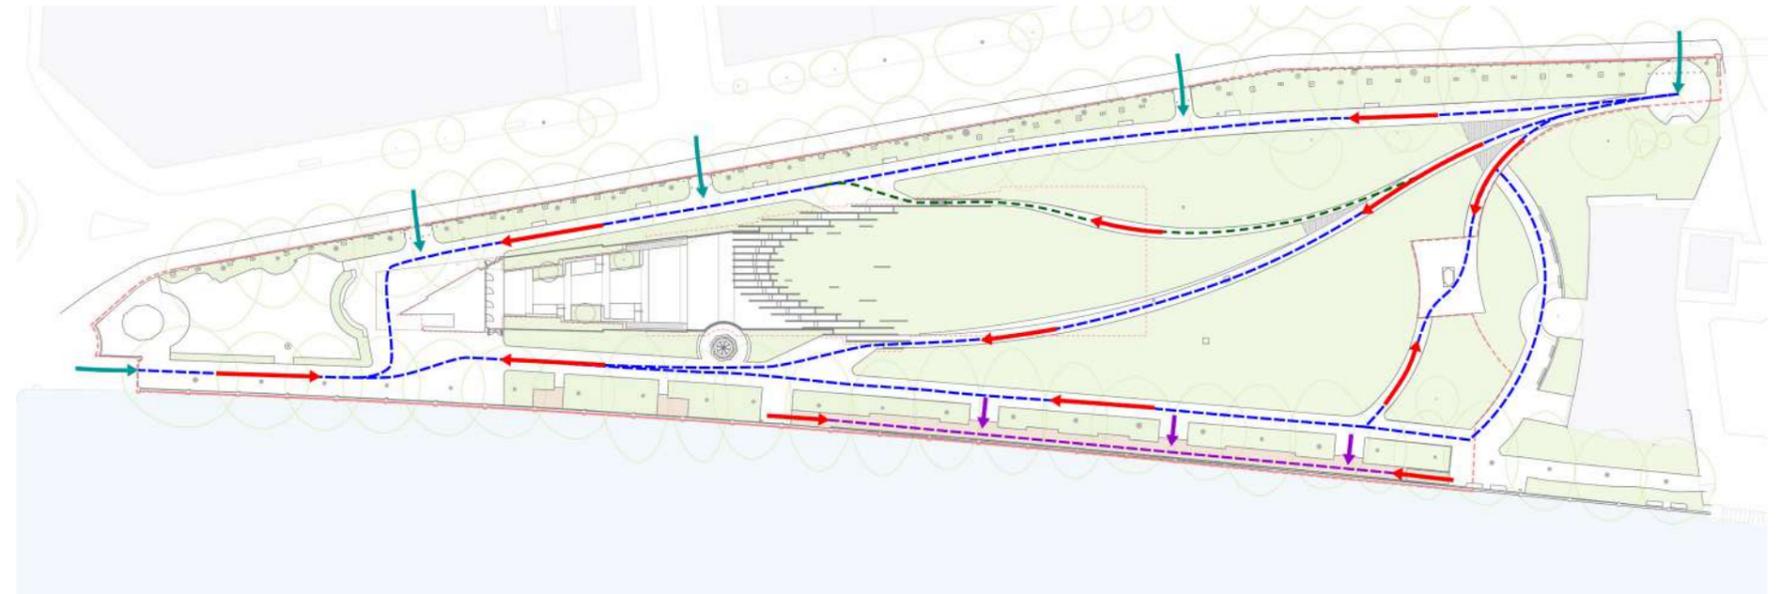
PROPOSED PLAN OF PATH NETWORK AND CONNECTIONS
